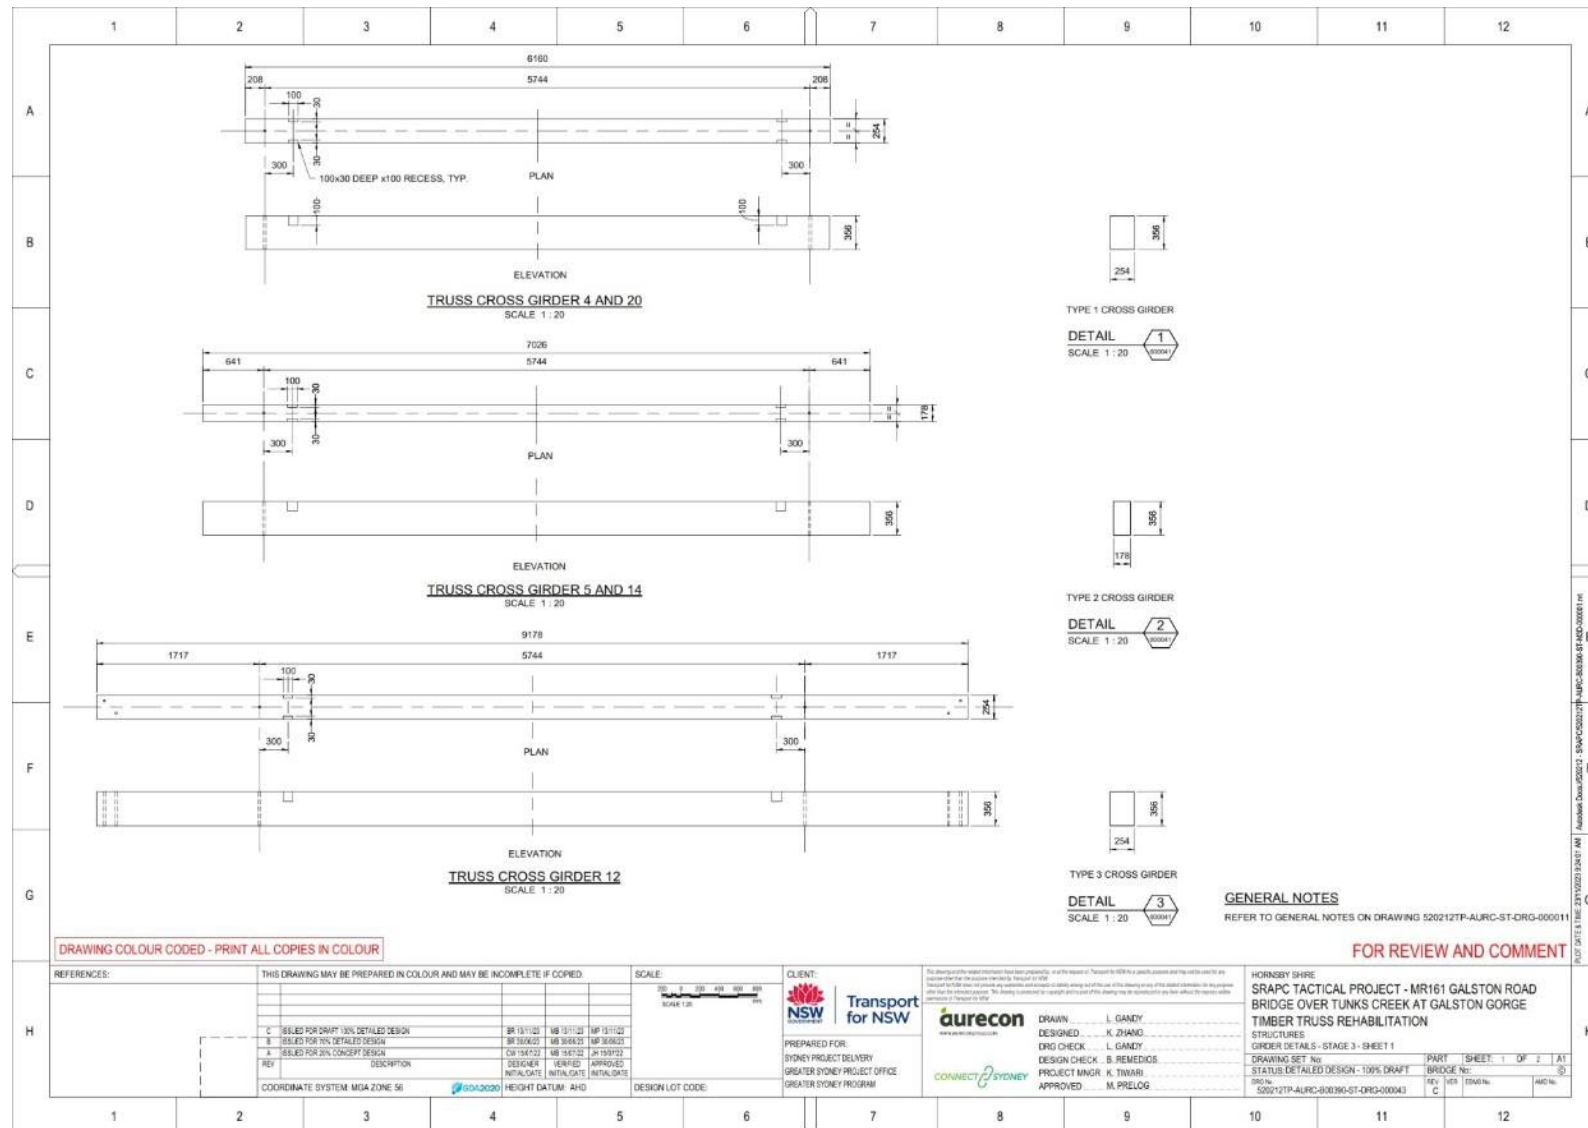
Structures girder details – Stage 3, sheet 1: 520212TP-AURC-B00390-ST-DRG-000043 (Source: Aurecon)
